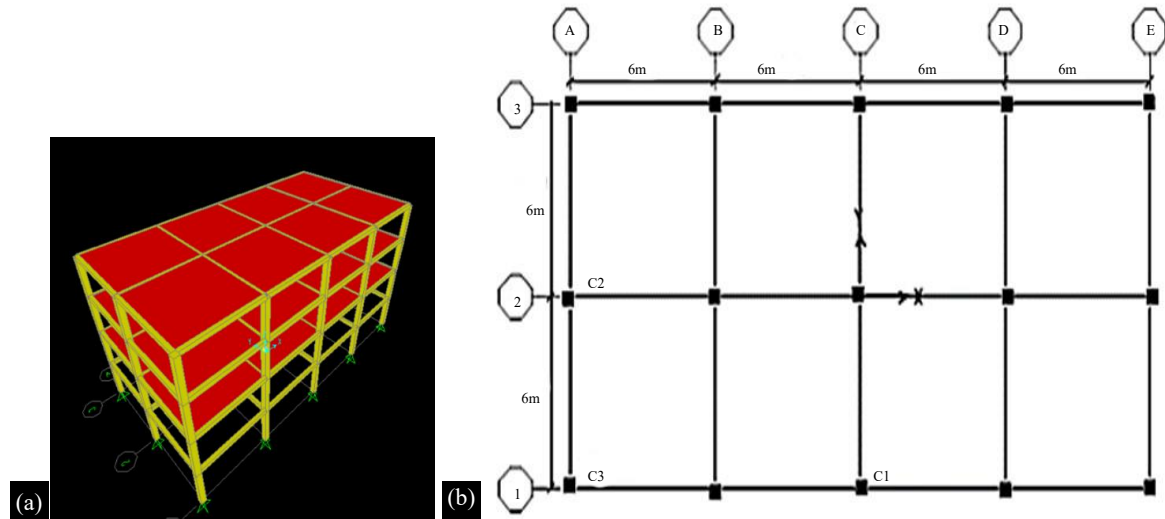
(a) 3D frame structure view. (b) Plan view of frame with removed column position.
